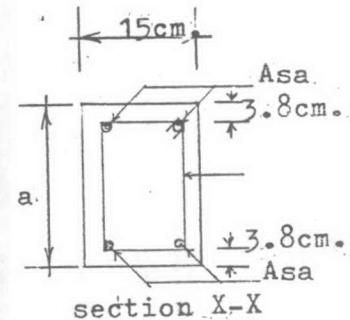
Details of reinforcement of tested frames, (Ref. 24)
